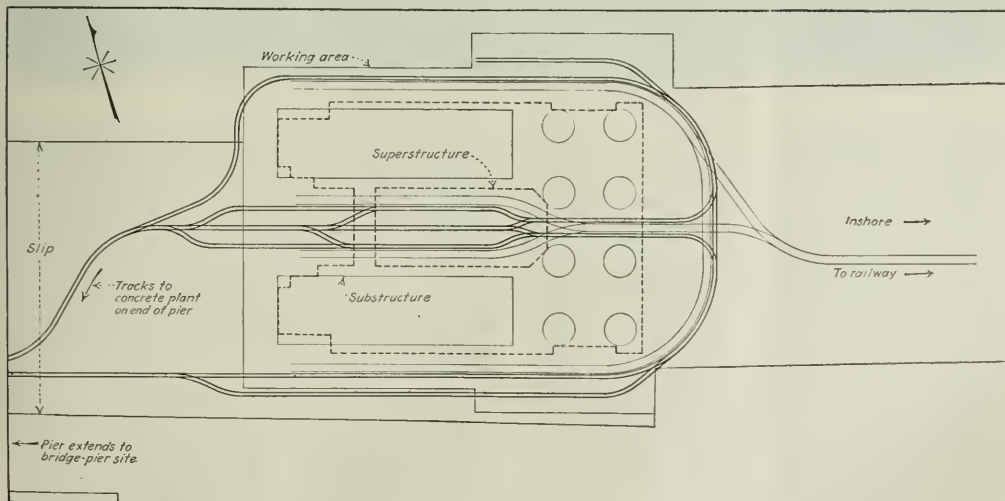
DIAGRAM TRACK PLAN FOR CAMDEN ANCHORAGE
